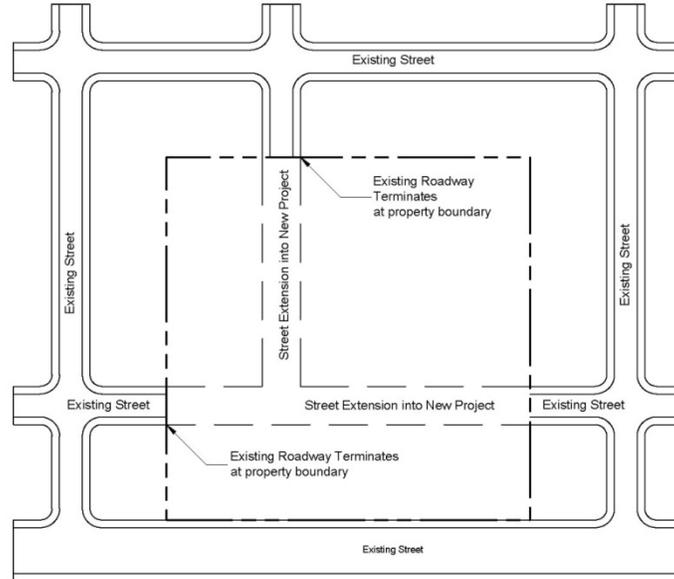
(a).1. – Site Layout – Street Extensions into New Projects/Developments
